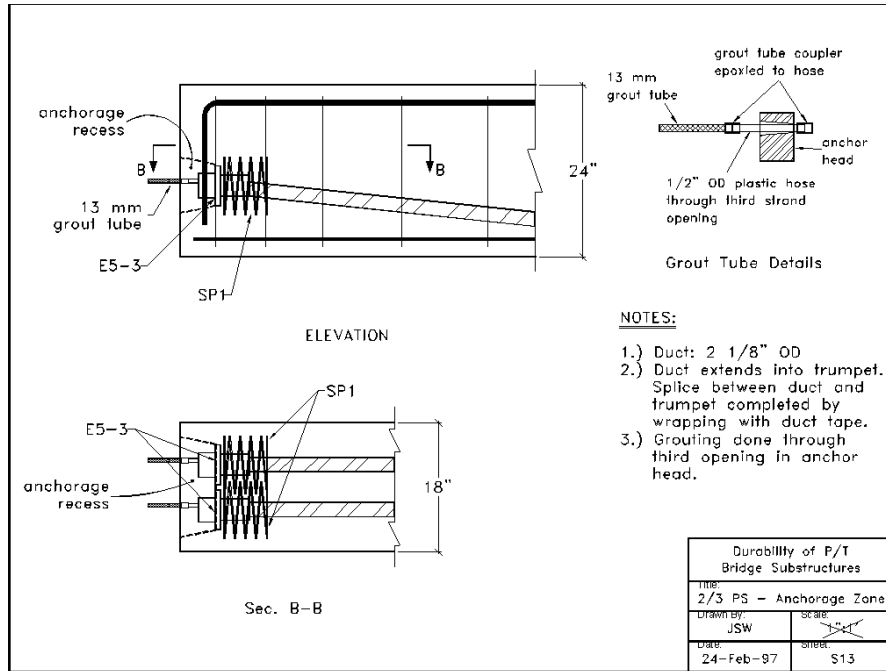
Sheet S13: 2/3 PS Anchorage Zone^{4.2}
